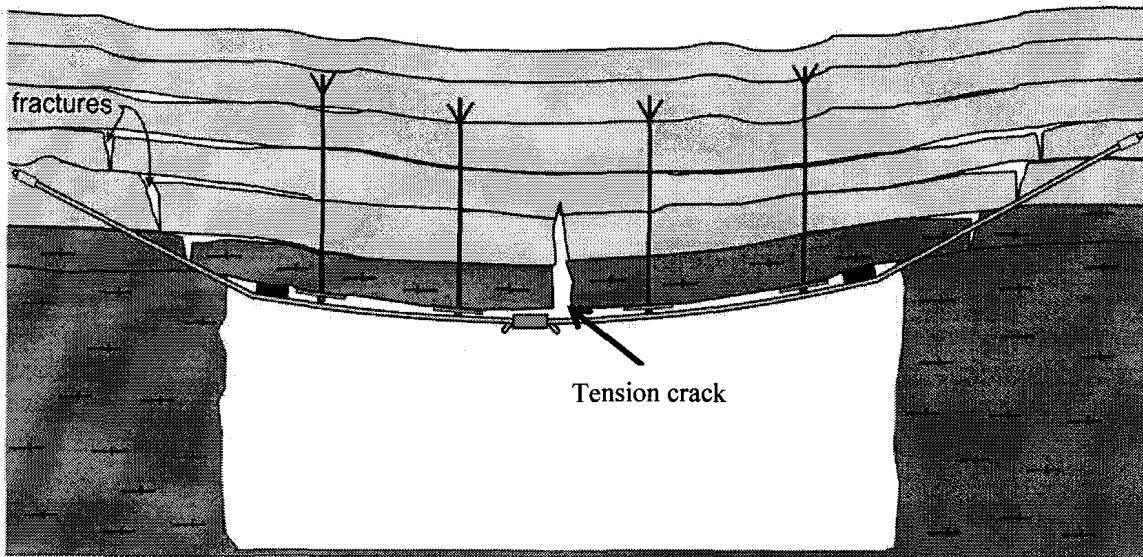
Cross section of entry showing two modes of failure caused by sagging roof (from Molinda and Mark, 2010).
